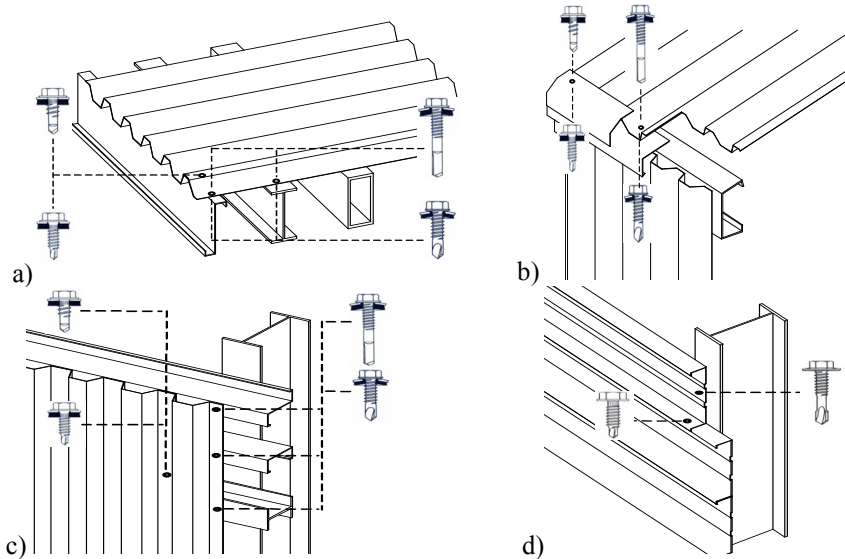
Application examples of self-drilling screws: (a) fastenings of roof sheeting on purlins; (b) fastening of sheeting at an eave detail; (c) fastening of wall sheeting on side rails; (d) fastenings of wall cassettes on stanchions
